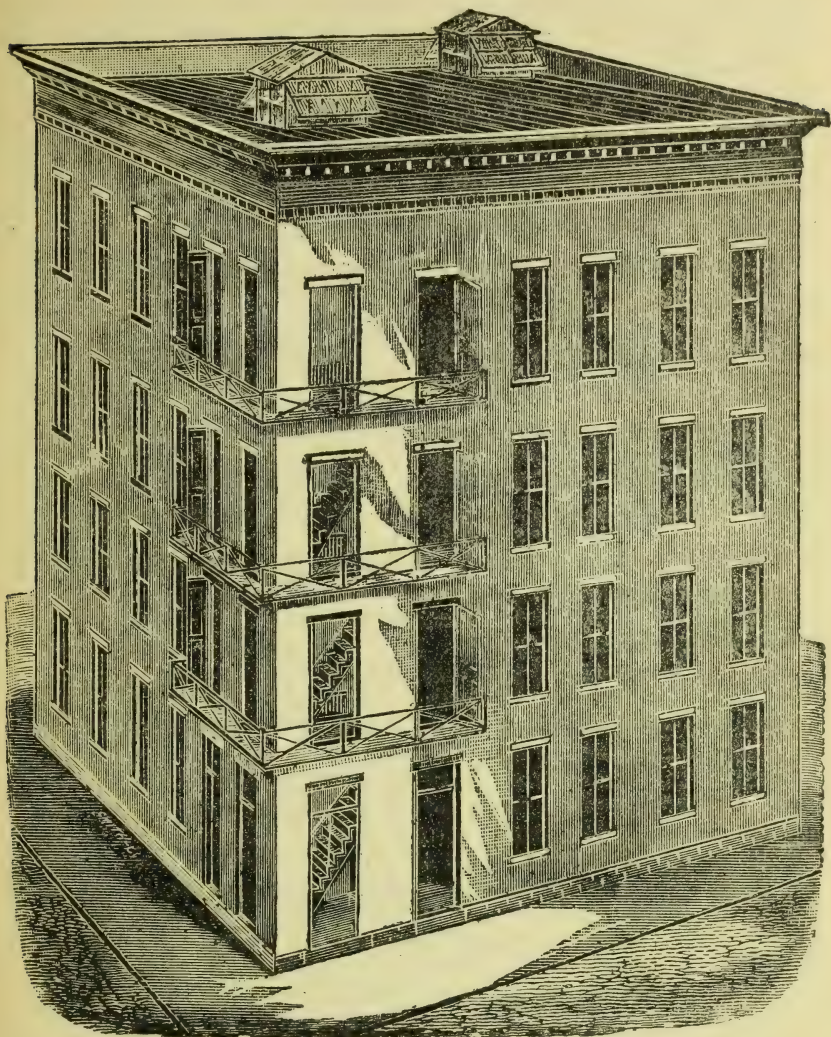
DORN'S FIREPROOF STAIRWAY, EXTERIOR APPEARANCE.
